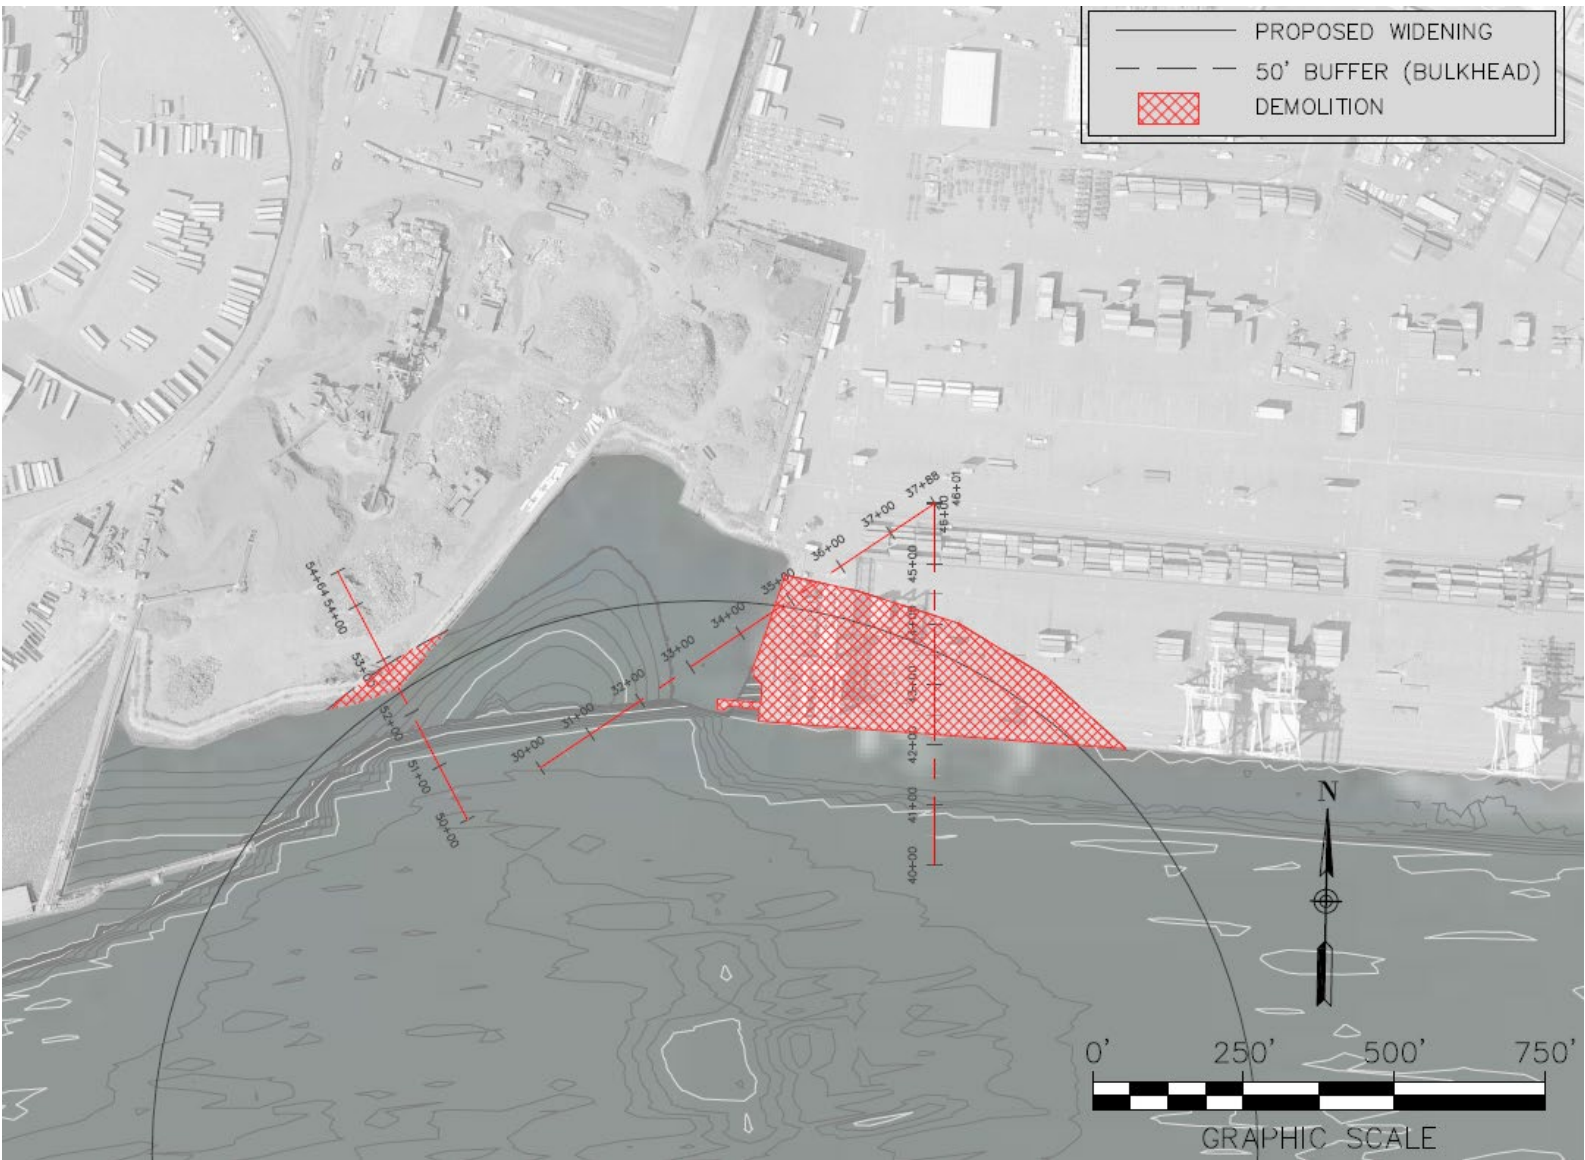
Schnitzer Steel Plan View for Cross Sections (showing Demo)
